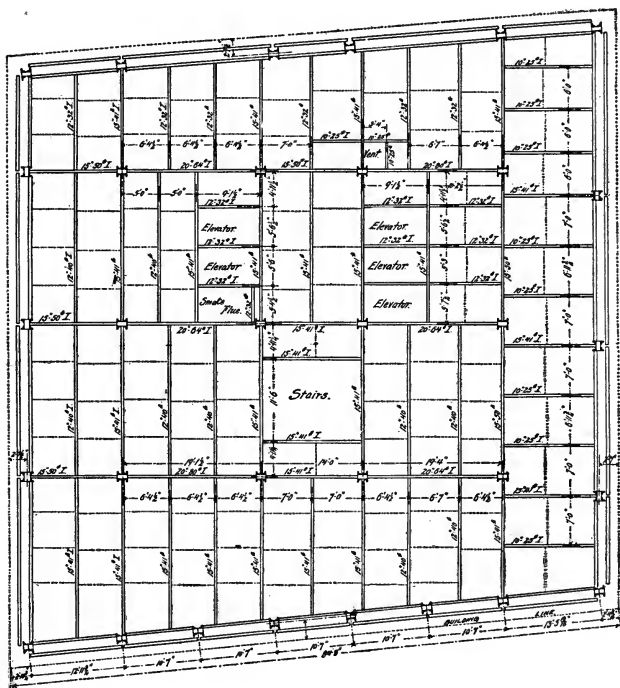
Typical Framing Plan, Am. Surety Co.'s Building, New York.
